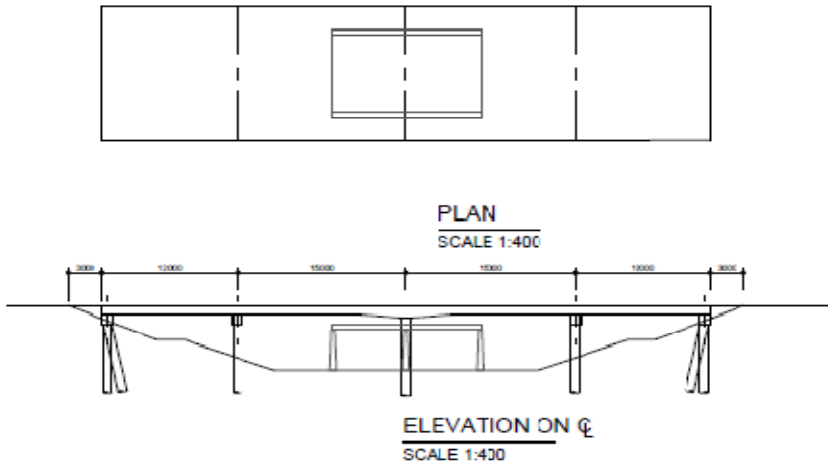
The Existing and Future Plan and Elevation for the Dorps Bridge
